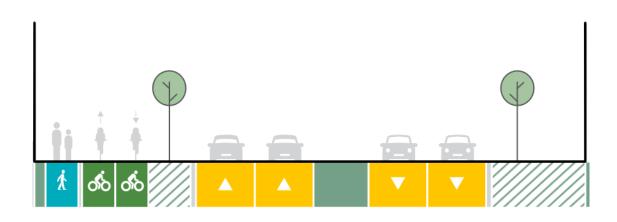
Typical rural cross section 35m – Access Road (south of Wookey Lane)
